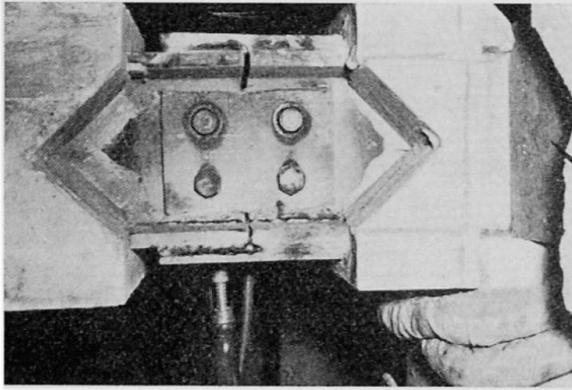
A joint made by using two extended I-beams locked and welded together.
